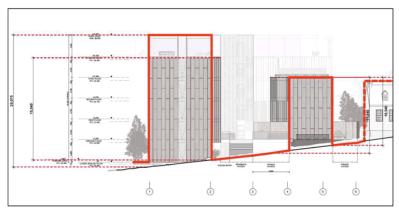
A closer view of the height comparison of existing and proposed buildings at the Sandy Bay Road end of Wilmot Street (Source: Room11 Architects).
